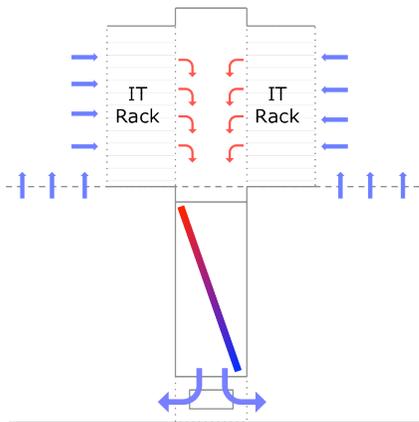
CRAH unit placement directly below the hot aisle; requires strict hot/cold air separation on the IT floor and a raised floor constructed as a full building story
